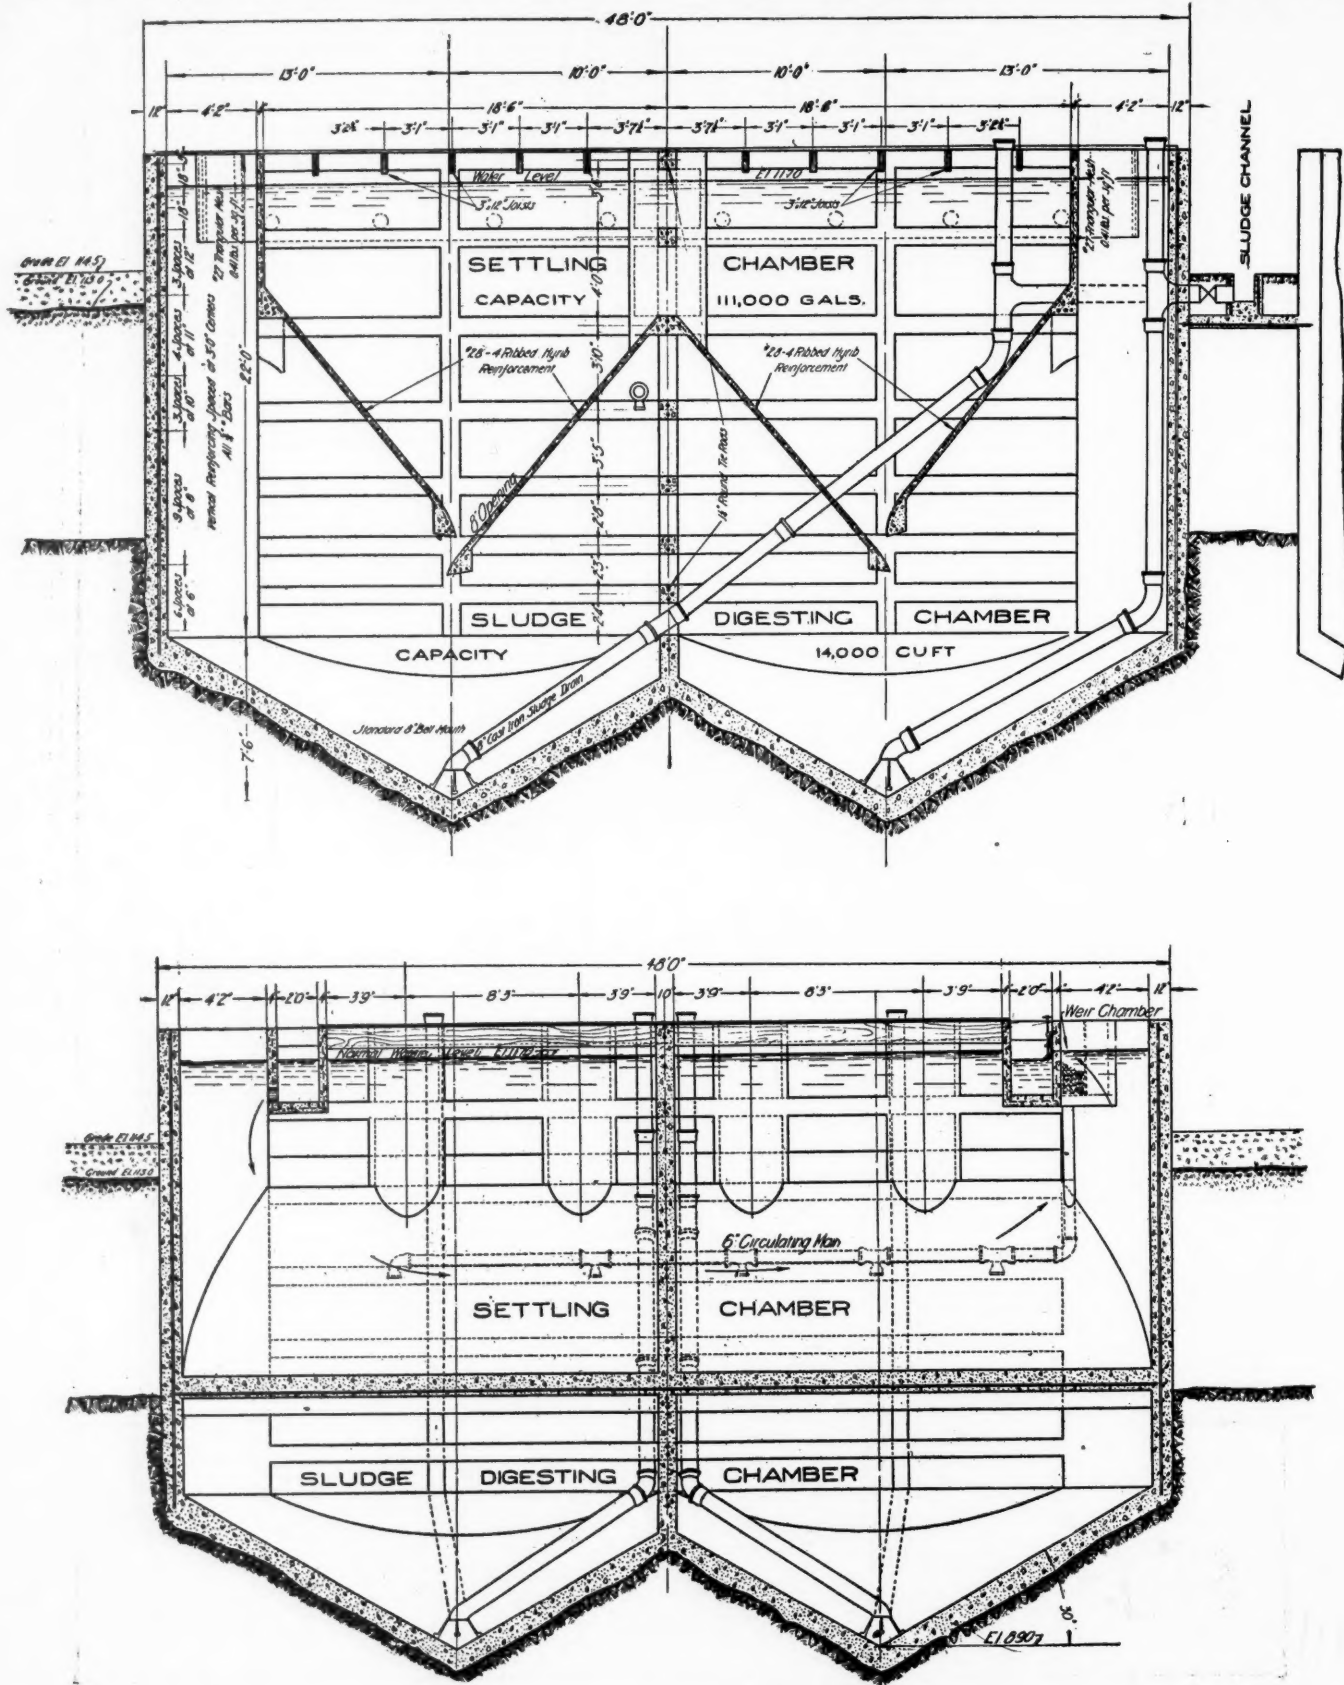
DETAIL SECTIONS OF MAIN SETTLING TANKS.
